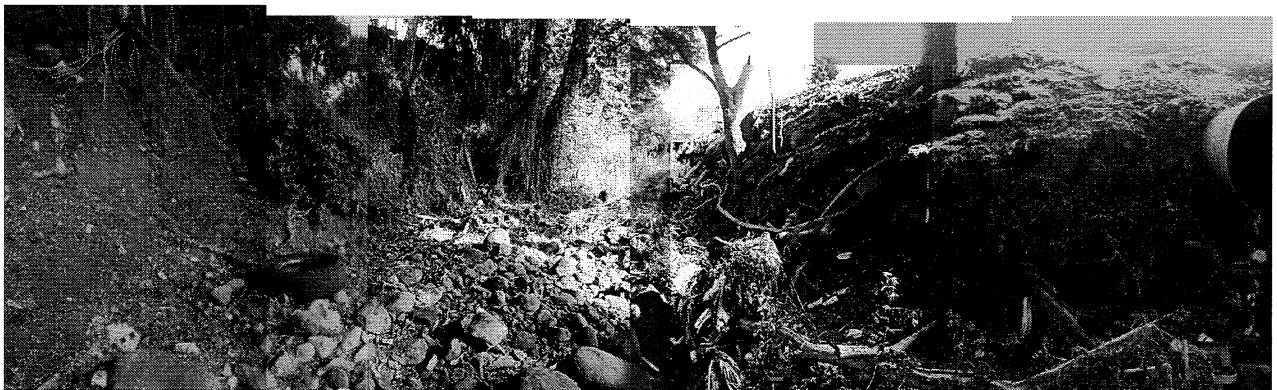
Aiea Stream Location 1. Top: Up-stream view showing right bank (left side of photo) proposed for shotcrete stabilization.
